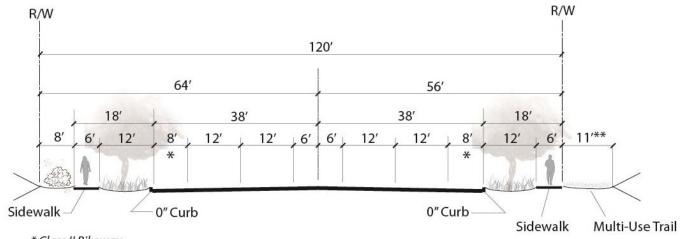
Alessandro Boulevard (pg 3-6)
